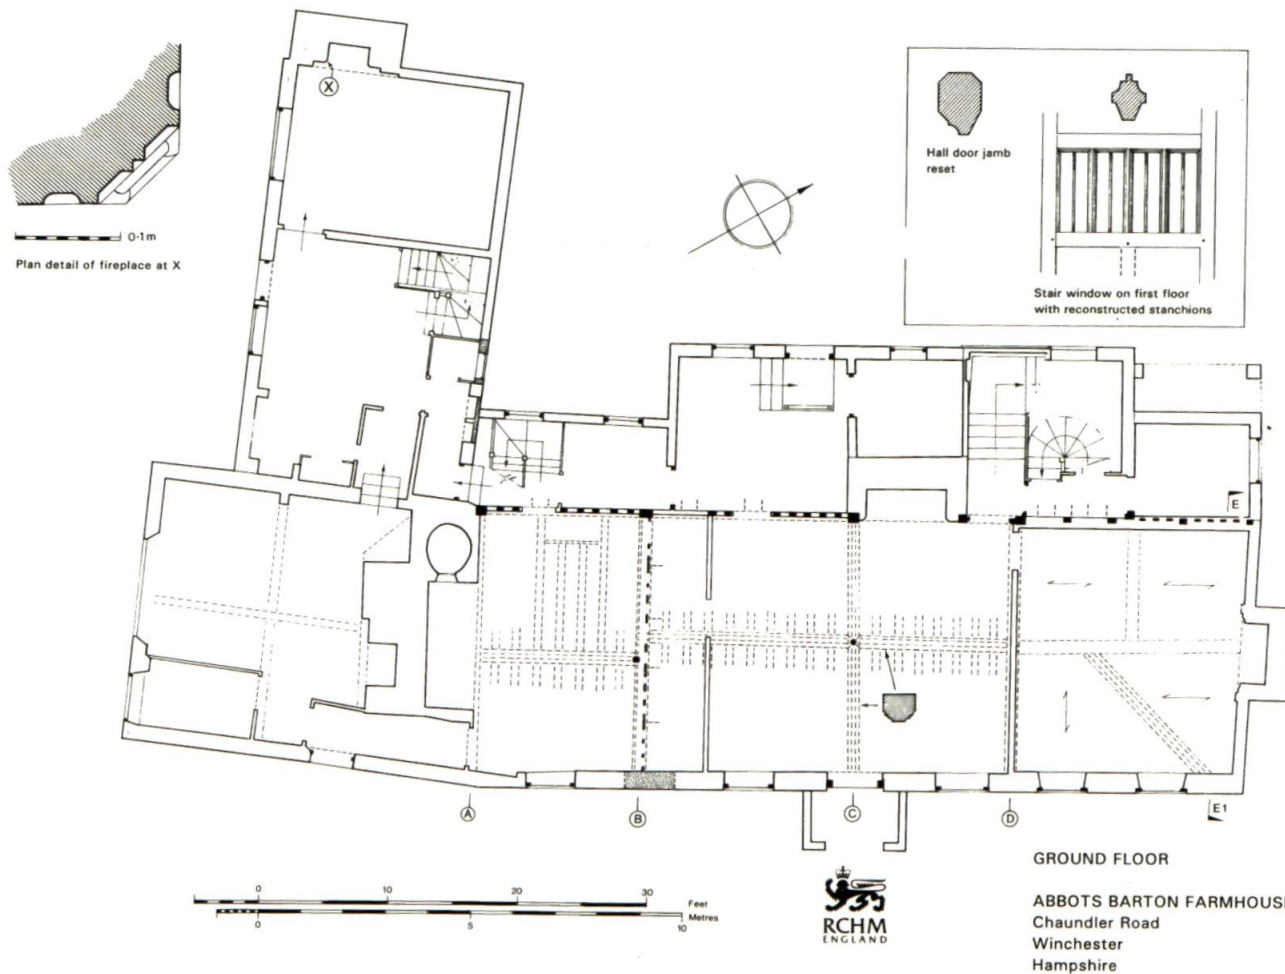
Abbots Barton Farmhouse: ground-floor plan. (Drawing by Nigel Fradgley)
